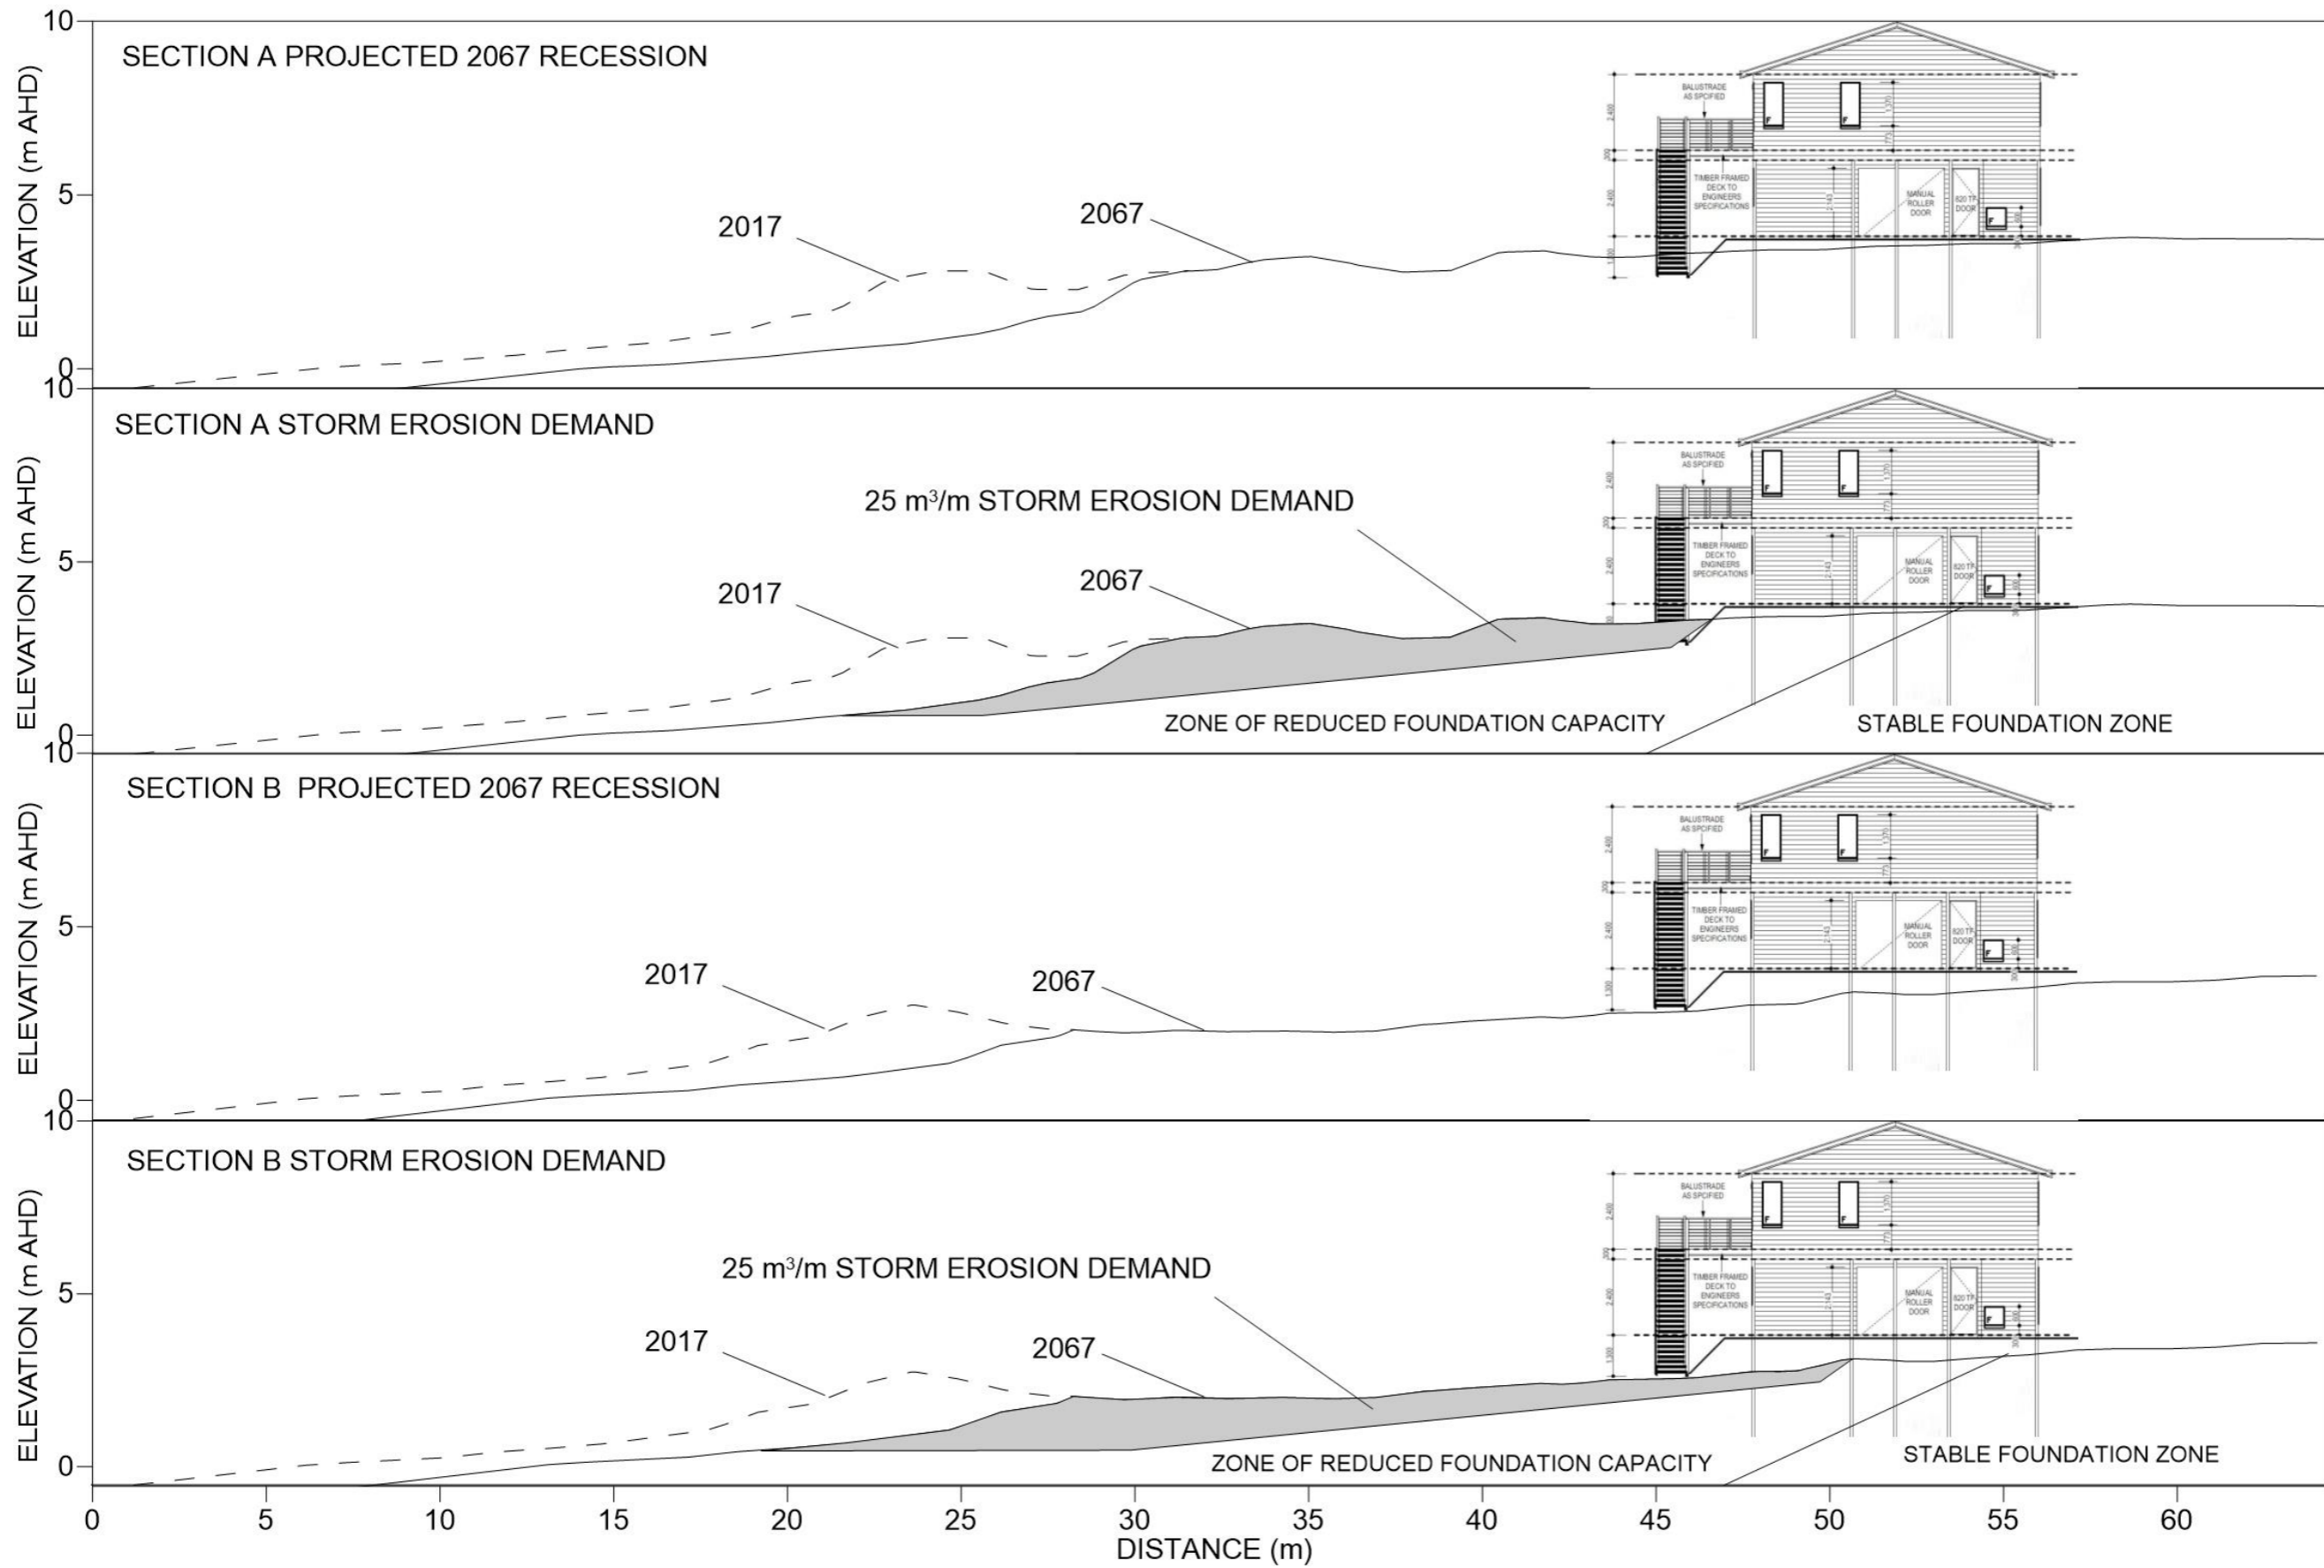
Site Cross Sections Demonstrating 2067 Recession and 25 m³/m Storm Erosion Demand
